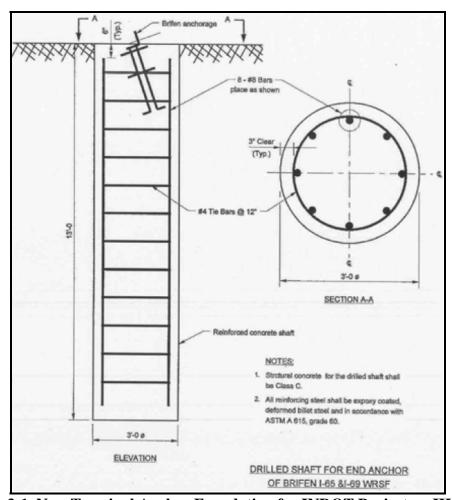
New Terminal Anchor Foundation for INDOT Project on IH 65 (4).
